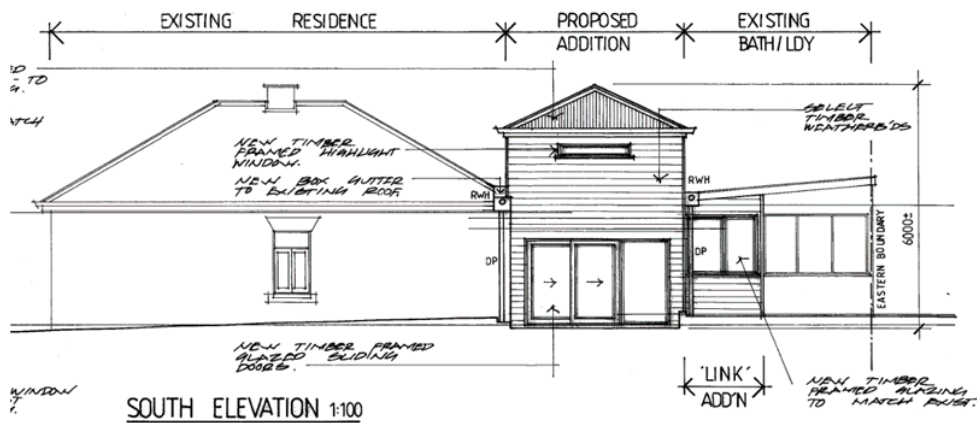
Southern (side) elevation of the previously refused application PLN-16-00492.
